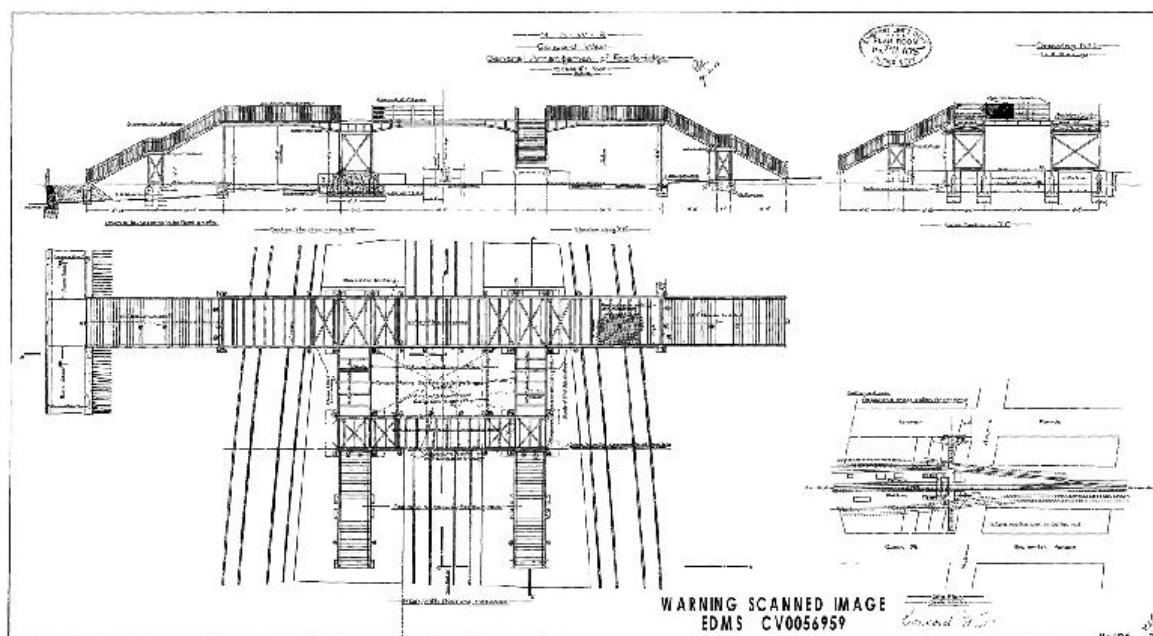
Plan of the Concord West overhead footbridge, 1916. (RailCorp Plan, Ref: 0056959)
